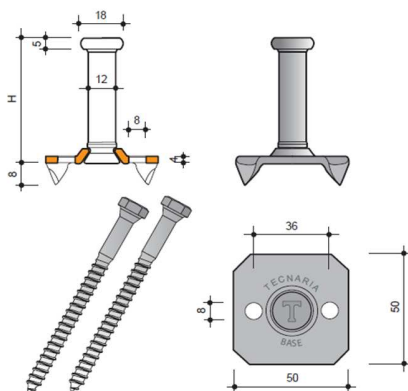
Connectors for Retrofitting of Timber Diaphragms
